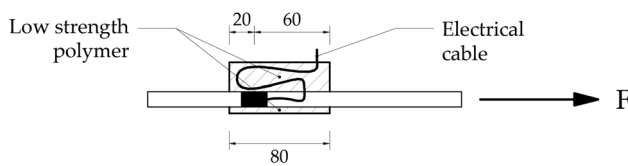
Detailing of the strain gauge isolation from the surrounding concrete.
